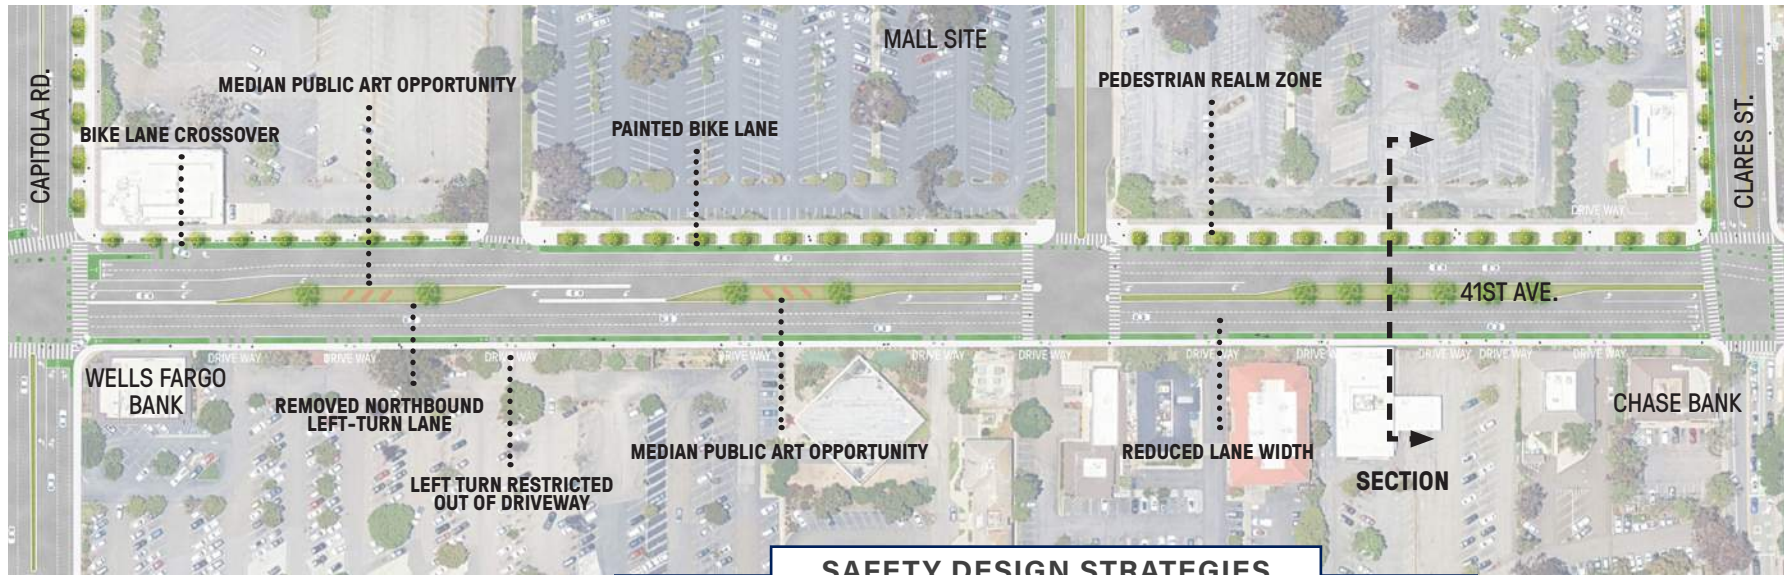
CLARES STREET TO CAPITOLA ROAD
